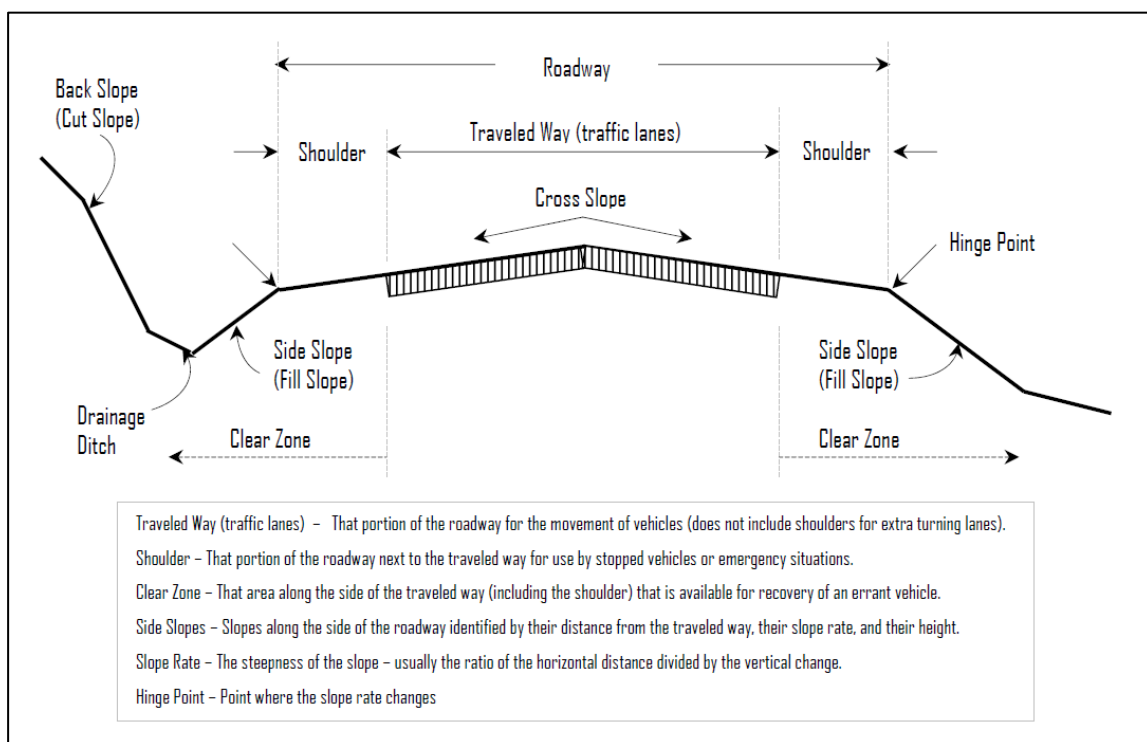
Roadway cross sectional elements, based on FHWA 1986 reported in Labi (2006).
